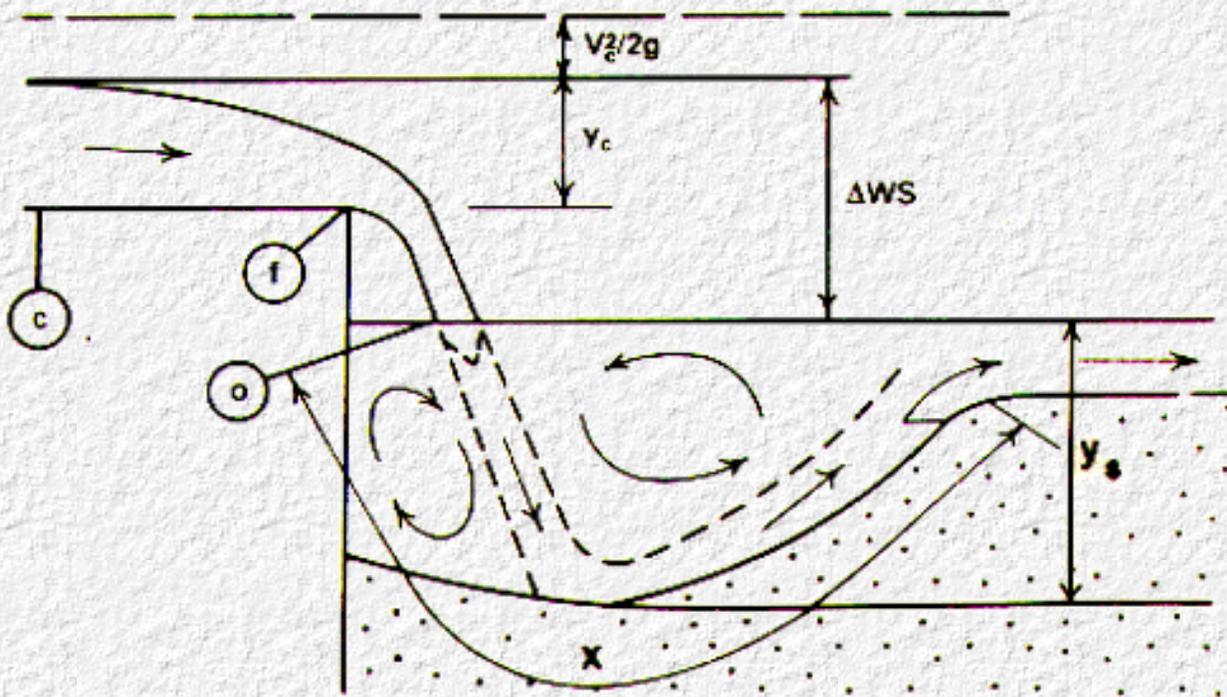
Flow and Scour Patterns at a Vertical Wall (after Laursen and Flick, 1983)
